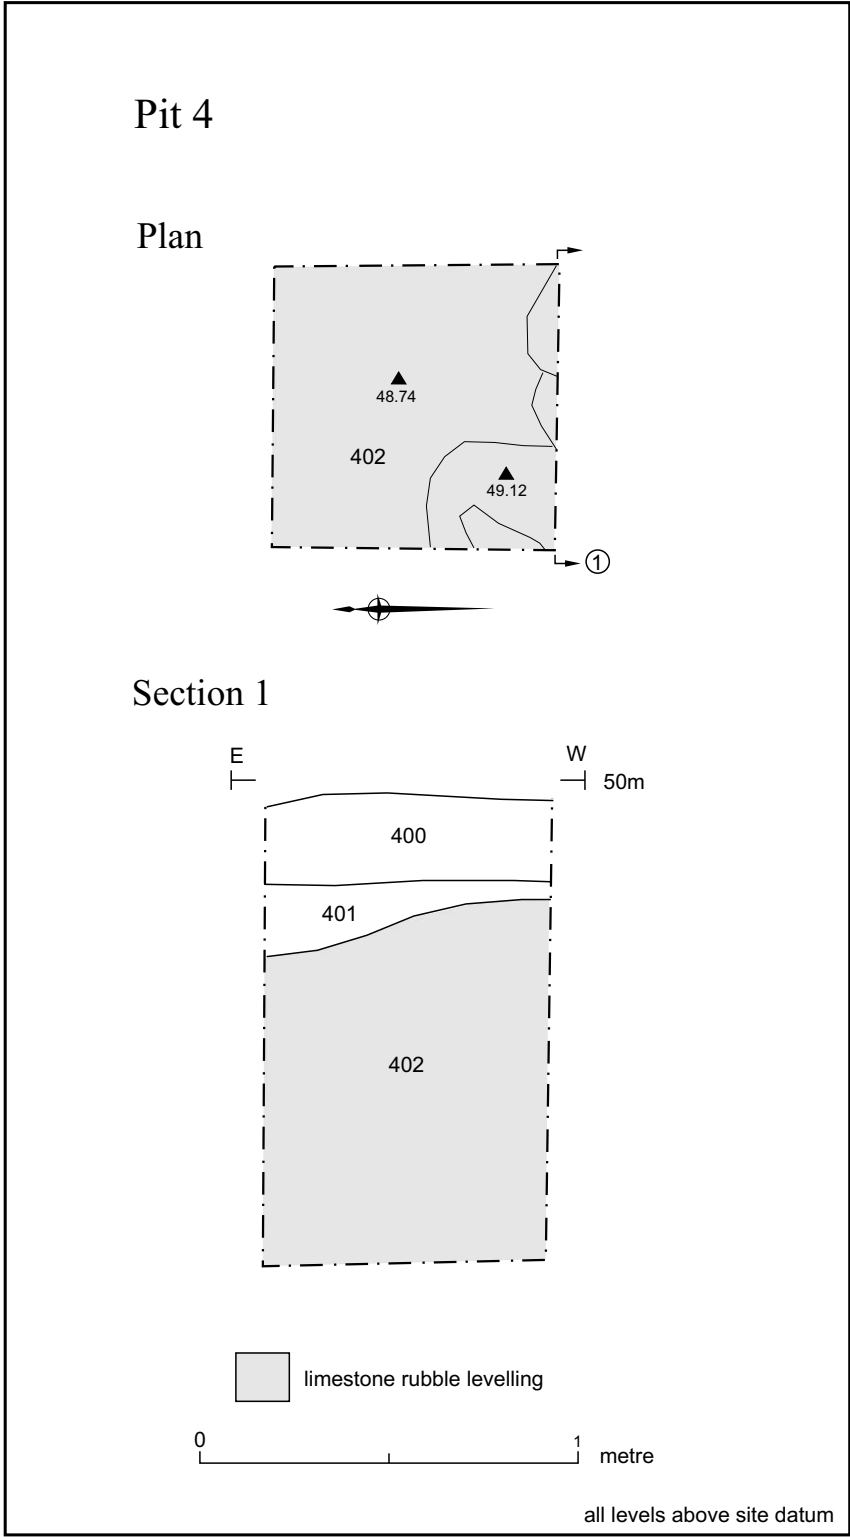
Pit 4: plan and section. Scale 1:20 @ A4.
